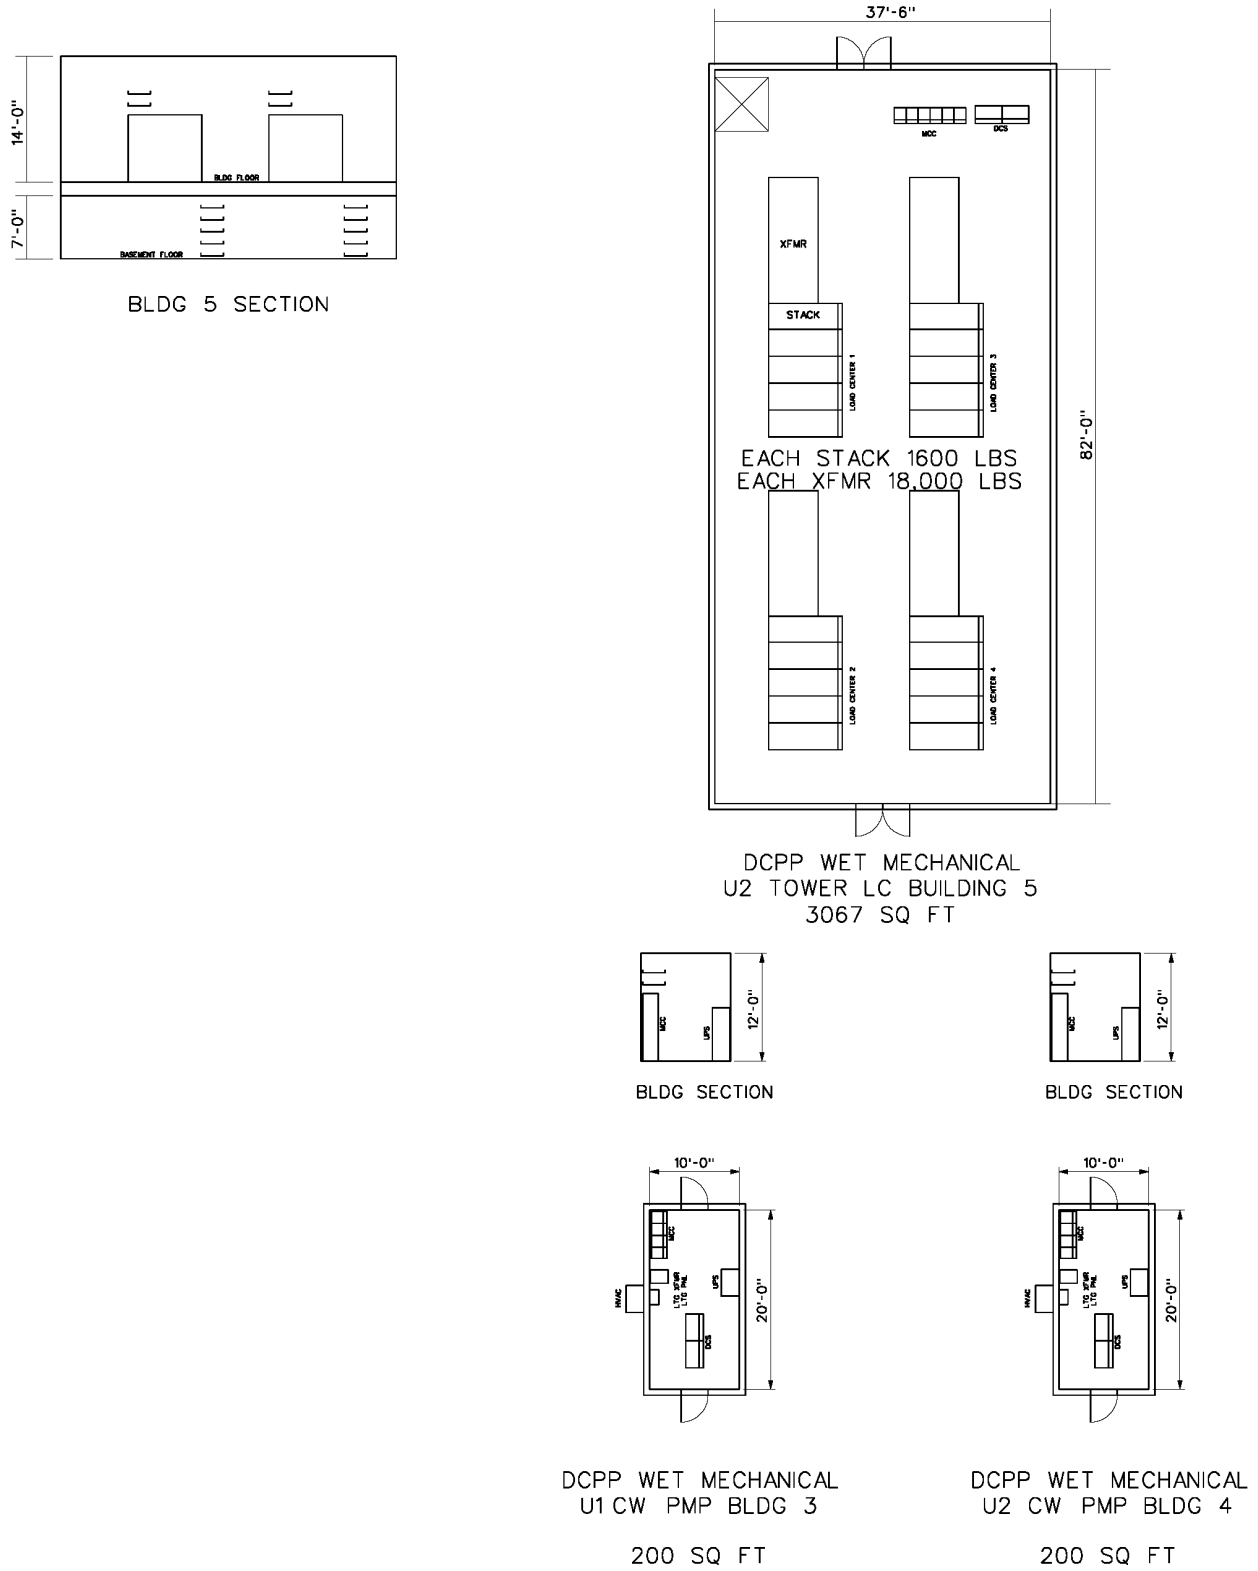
Wet Mechanical (Forced) Draft Cooling—Cooling Tower and Pumphouse Electrical Buildings
